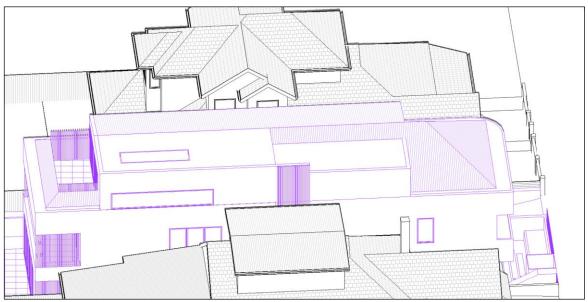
Proposed 11am sun eye diagram (source: CAD Draft, dated 12/05/2025)
